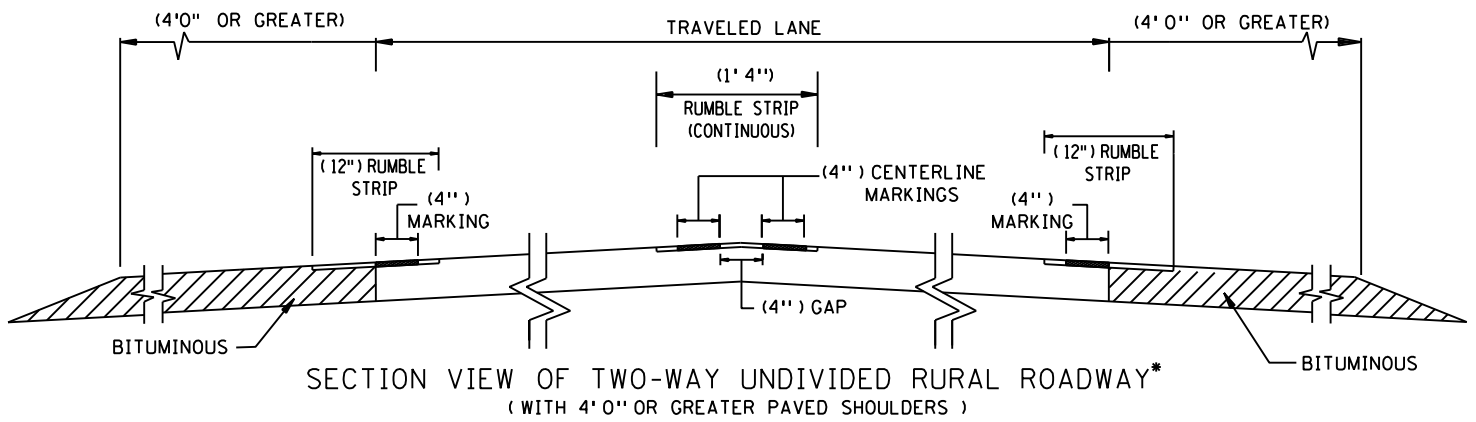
SHOULDER RUMBLE STRIP AND CENTERLINE RUMBLE STRIP - SECTION VIEW
